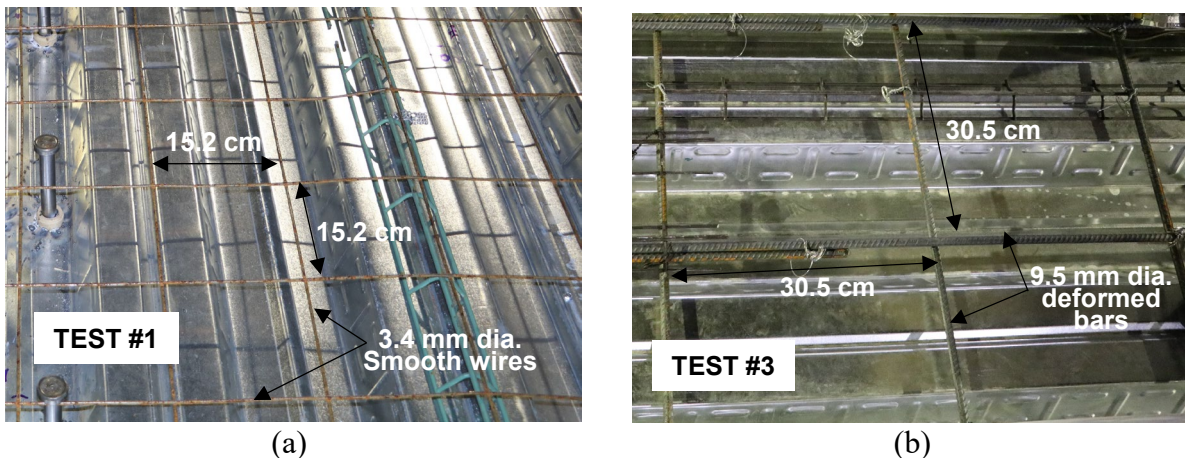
Slab reinforcement (a) Test #1; (b) Test #3.
